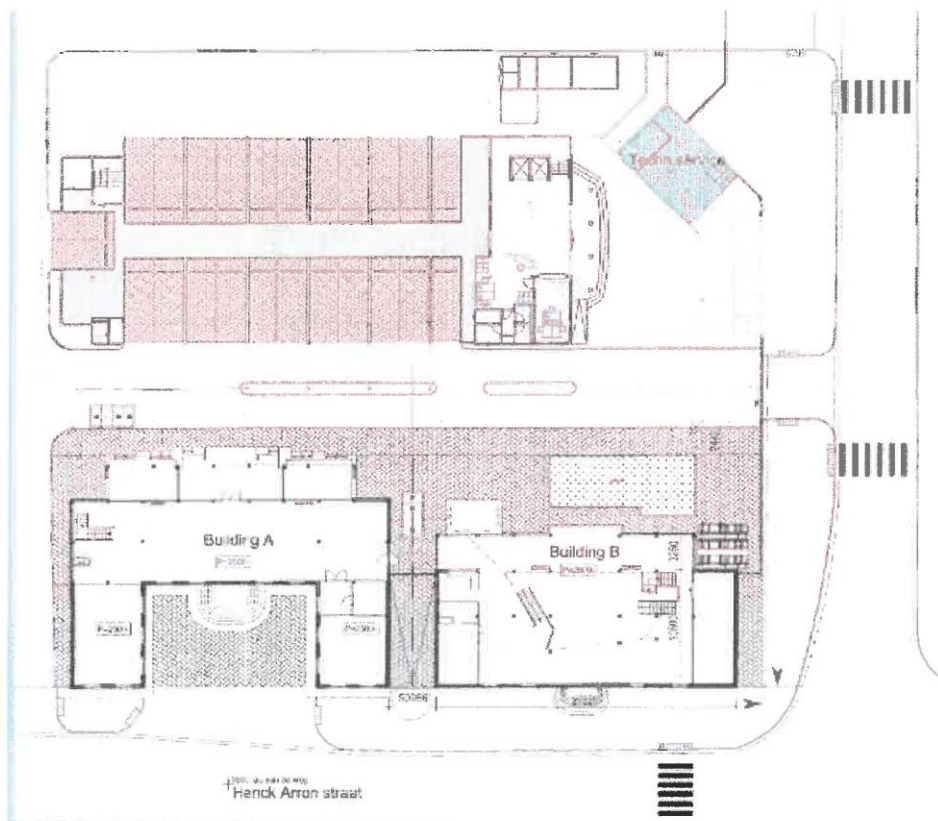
The floor plan of the new National Assembly Hall in relation to the two reconstructed buildings A and B at the Henck Arronstraat (DAS Architects, January 2023)
